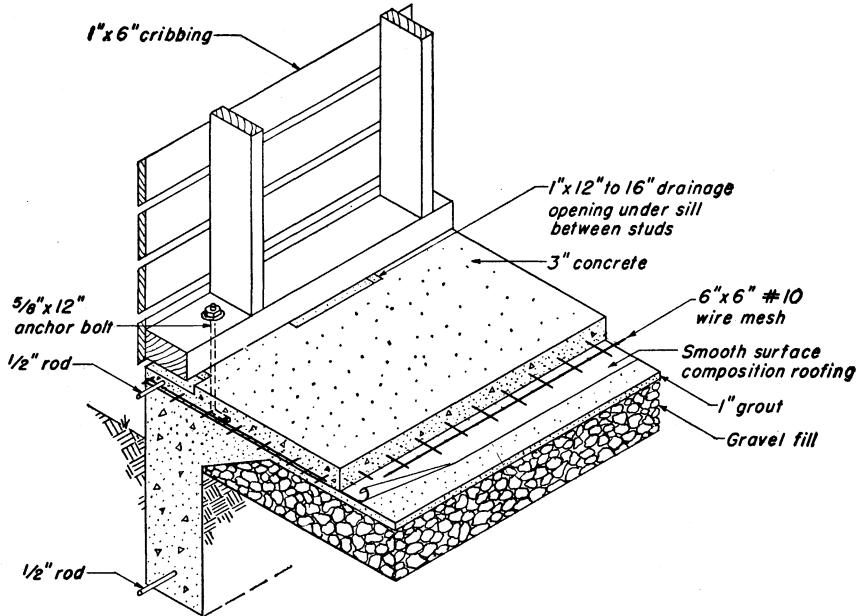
Concrete floor and sill. Note anchor bolts and the drainage openings under the sill between each pair of studs. In well-drained locations, if gravel fill is used as shown, composition roofing may be omitted; if fill is earth instead of gravel, composition roofing should be used as shown.
